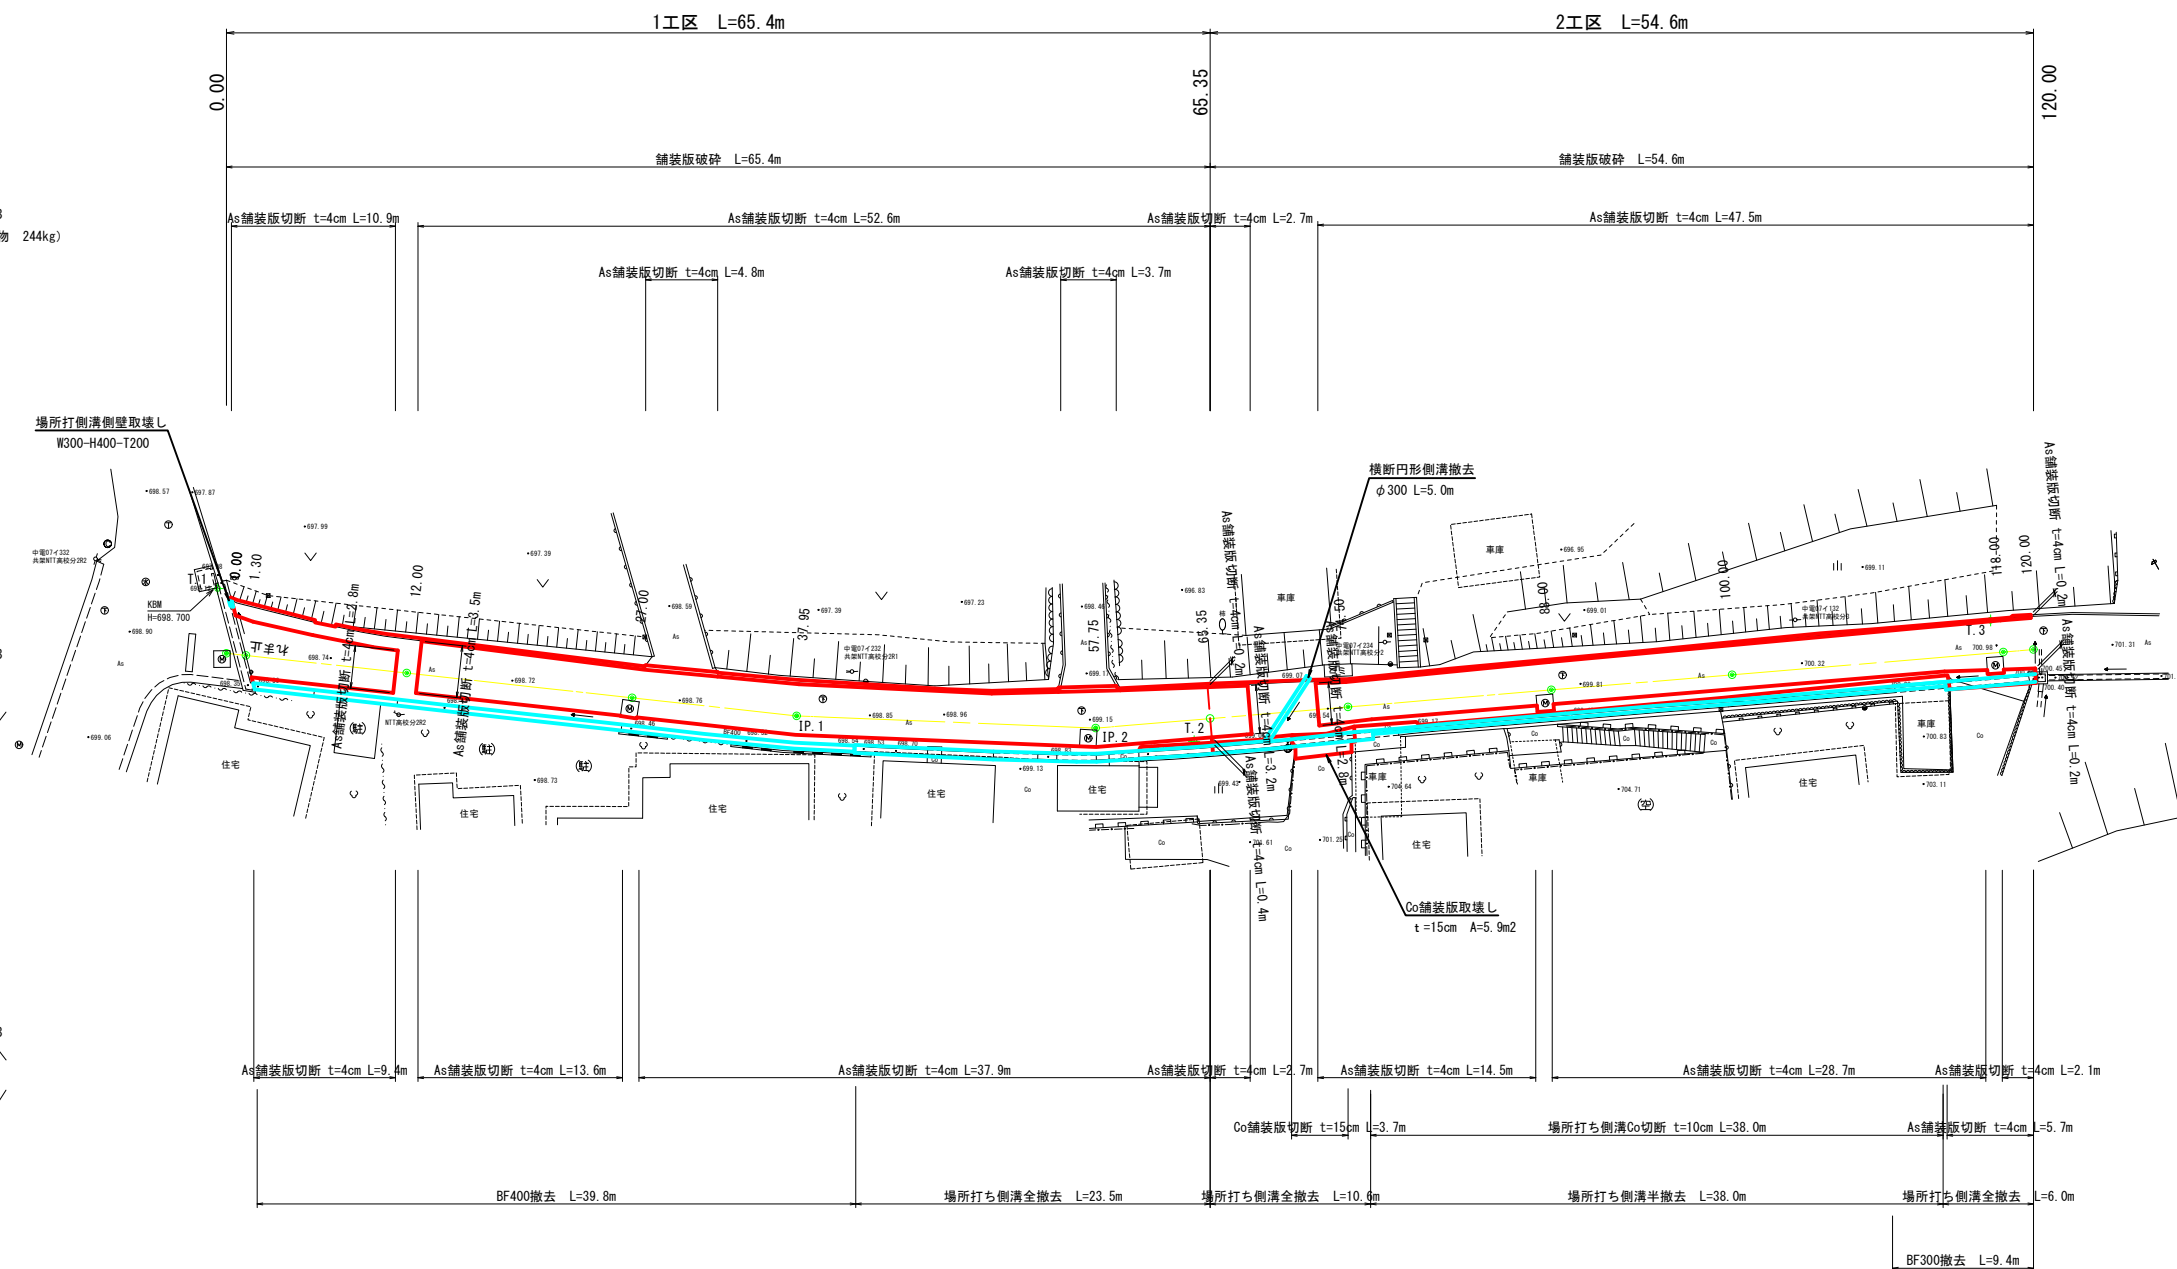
is a plan view of a concrete cut (コンクリート切). It shows a cross-section of a structure with various dimensions. A red outline highlights a specific area on the left side. The dimensions are as follows:
